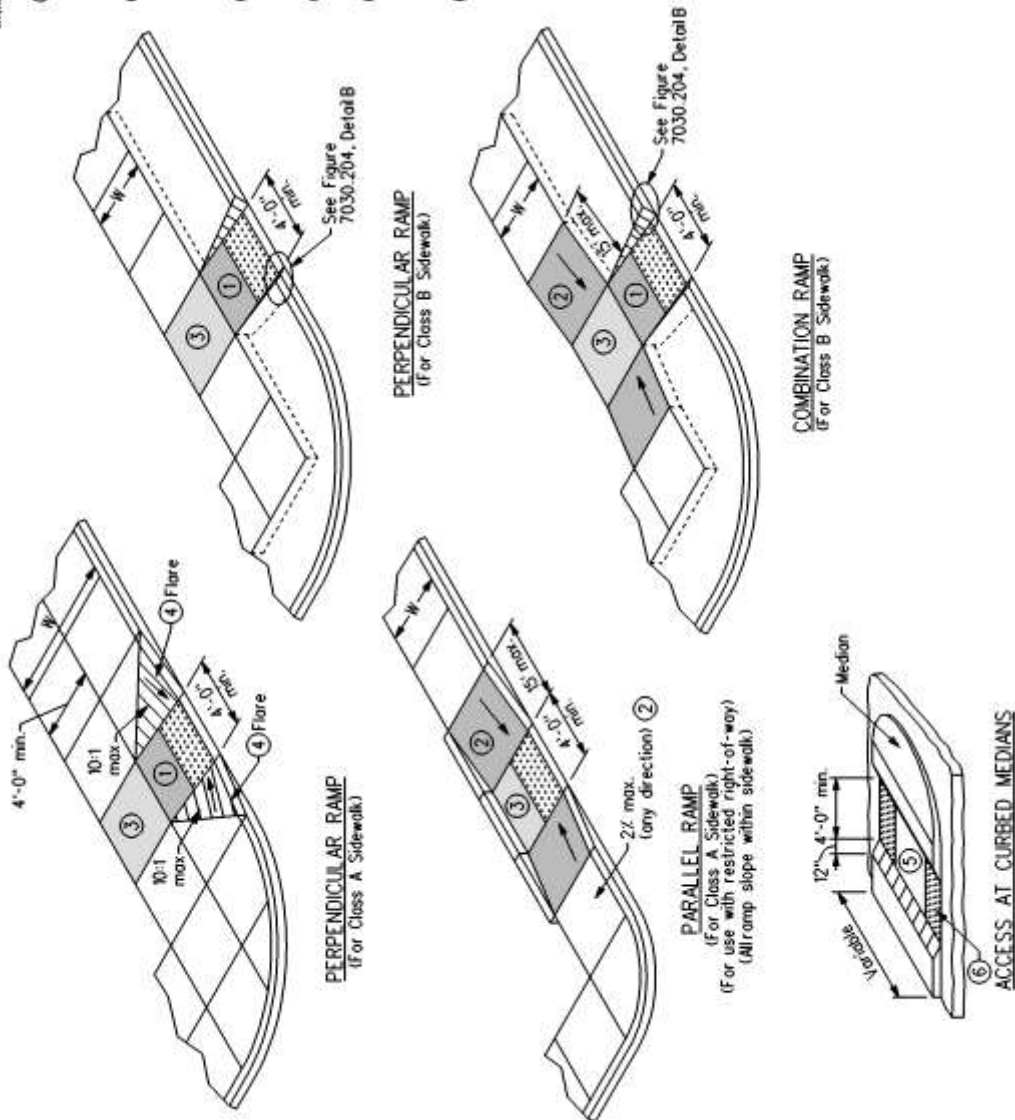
CURB RAMPS WITHIN INTERSECTION RADIUS FOR CLASS A SIDEWALK
